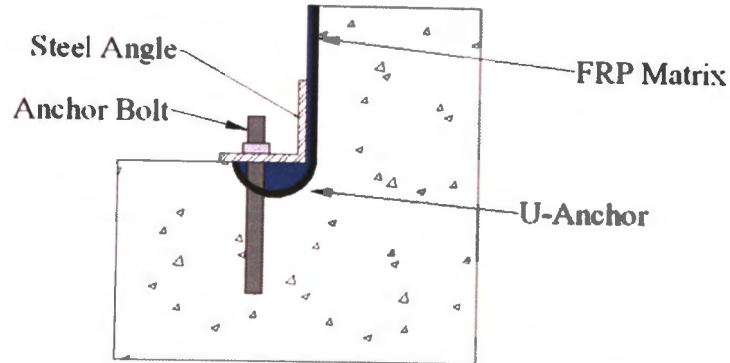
Modified U-Anchor Used in Nagy-György et al. (2005)
